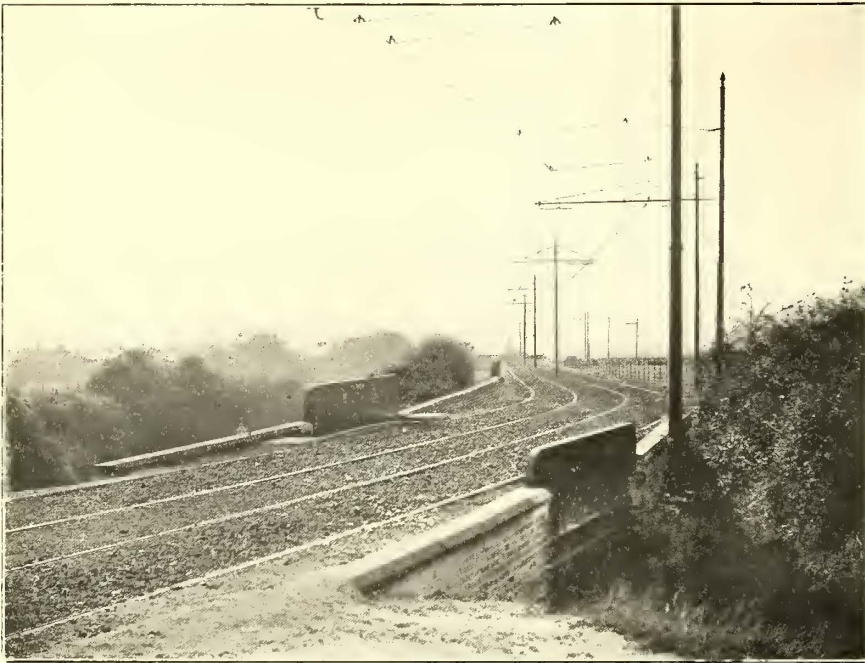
THE LINE CARRIED ON EMBANKMENT OVER MAIN ROAD
